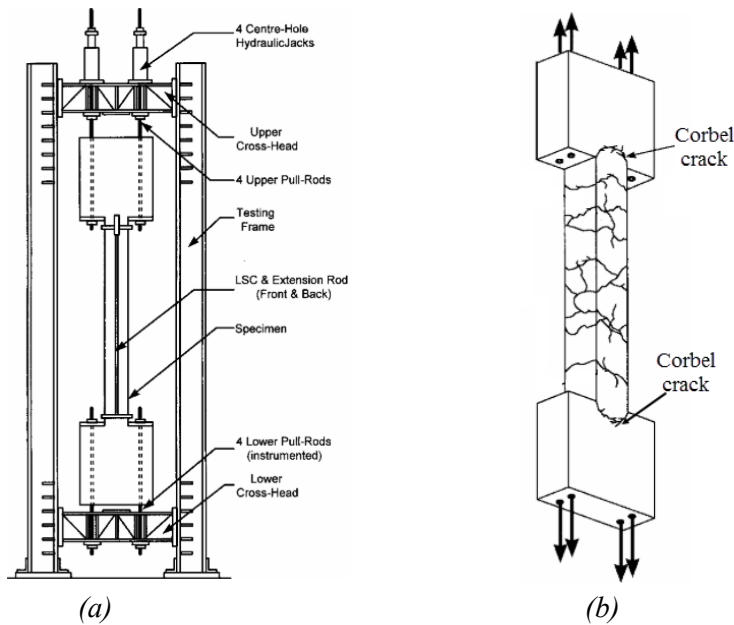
Corbel-shaped specimen for tensile element (a) General geometry of concrete specimen (b) Localized crack at the place of change of section width [7].
